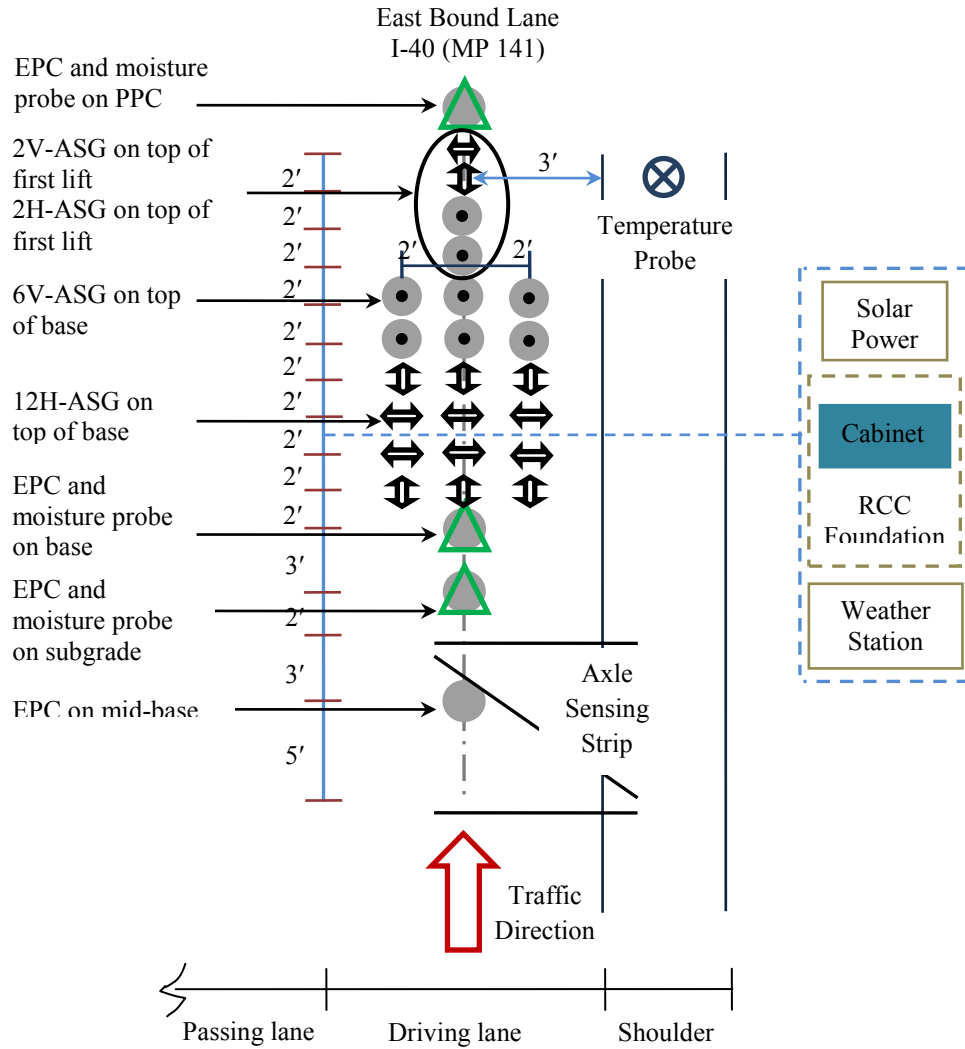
Instrumented Pavement Section (I-40, MP 141)
